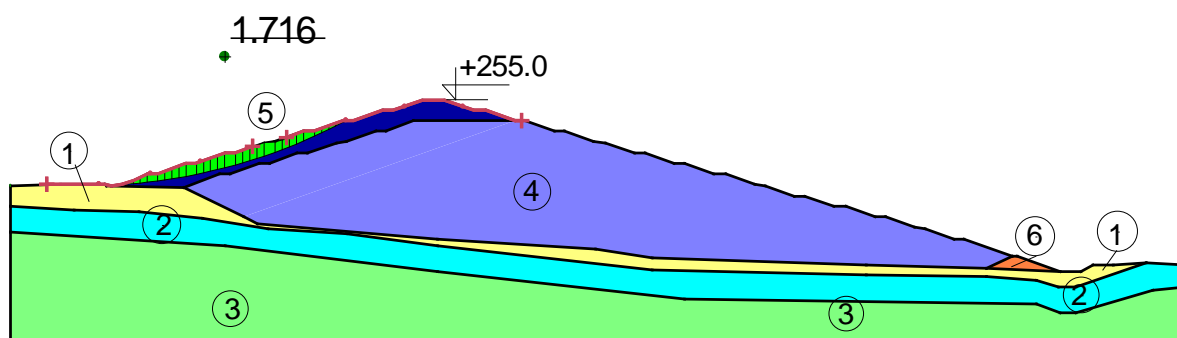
Section 4 - Final phase of landfill construction, situation after the recultivation, static conditions, left slope, $F_s=1.716$
